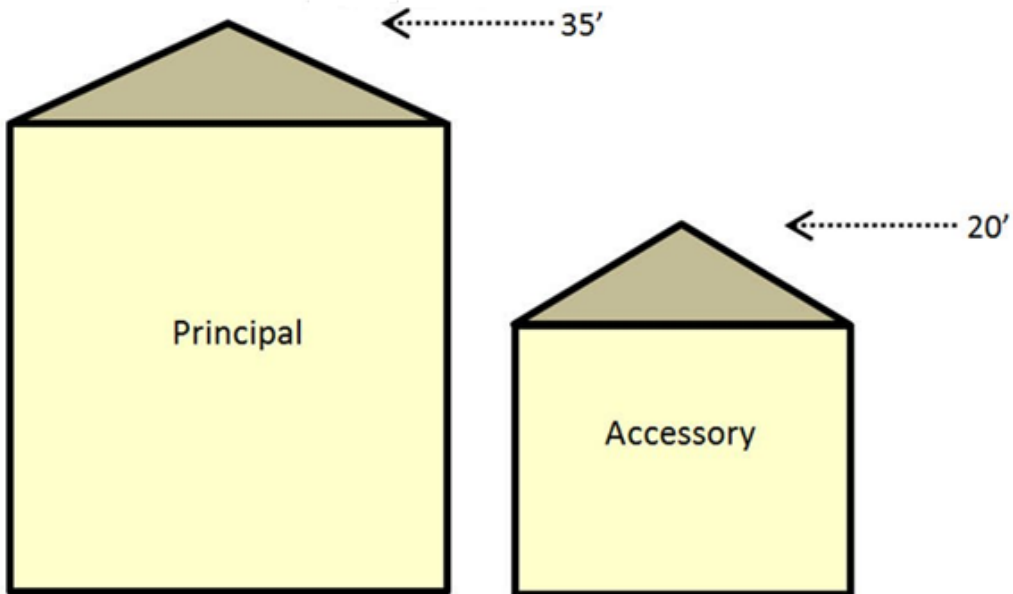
Typical RR-1 Zoning District Building Height Example (Abutting Lots Not Developed) (Not Drawn to Scale)
